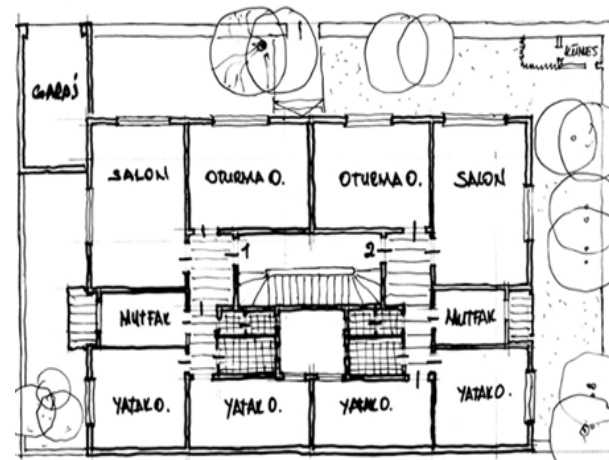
New building first floor plan. Sketch: Prof. Dr. Ahmet Alkan.
